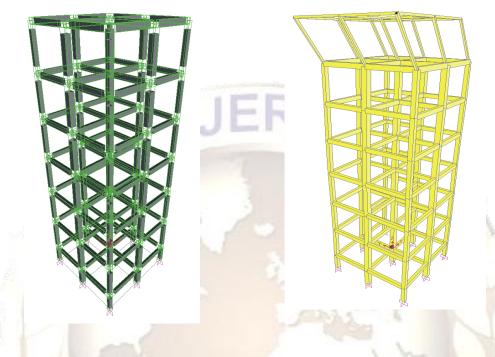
(a) Building without TMD (b) Building indicating soft storey at top
